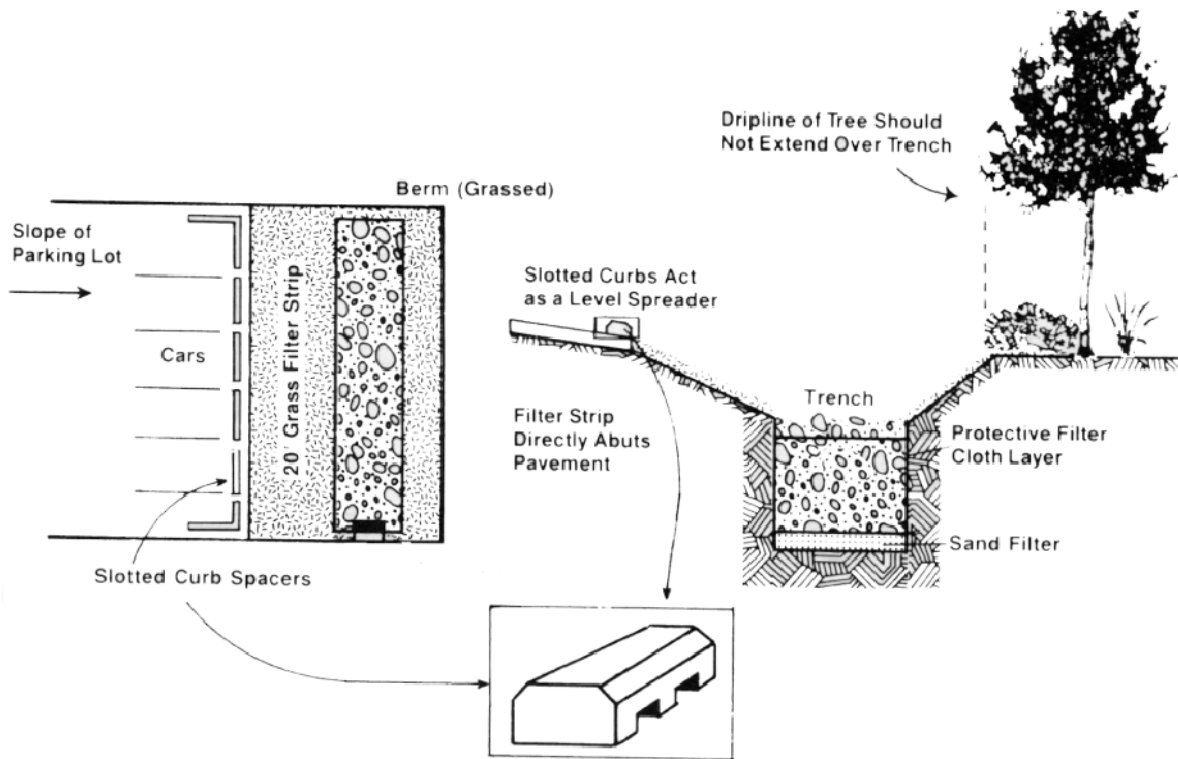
Typical parking lot infiltration trench used in Minnesota (Source: Barr Engineering, 2001a, p. 3-171)
